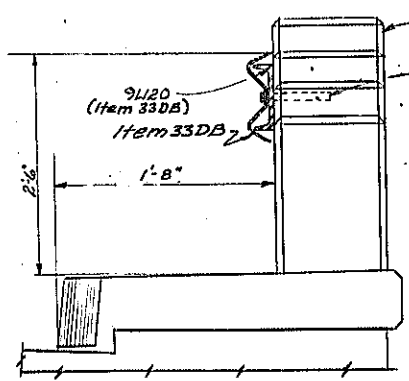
DETAIL OF BEAM SPLICE OVER AN EXPANSION JOINT (PLACE BETWEEN POSTS)
